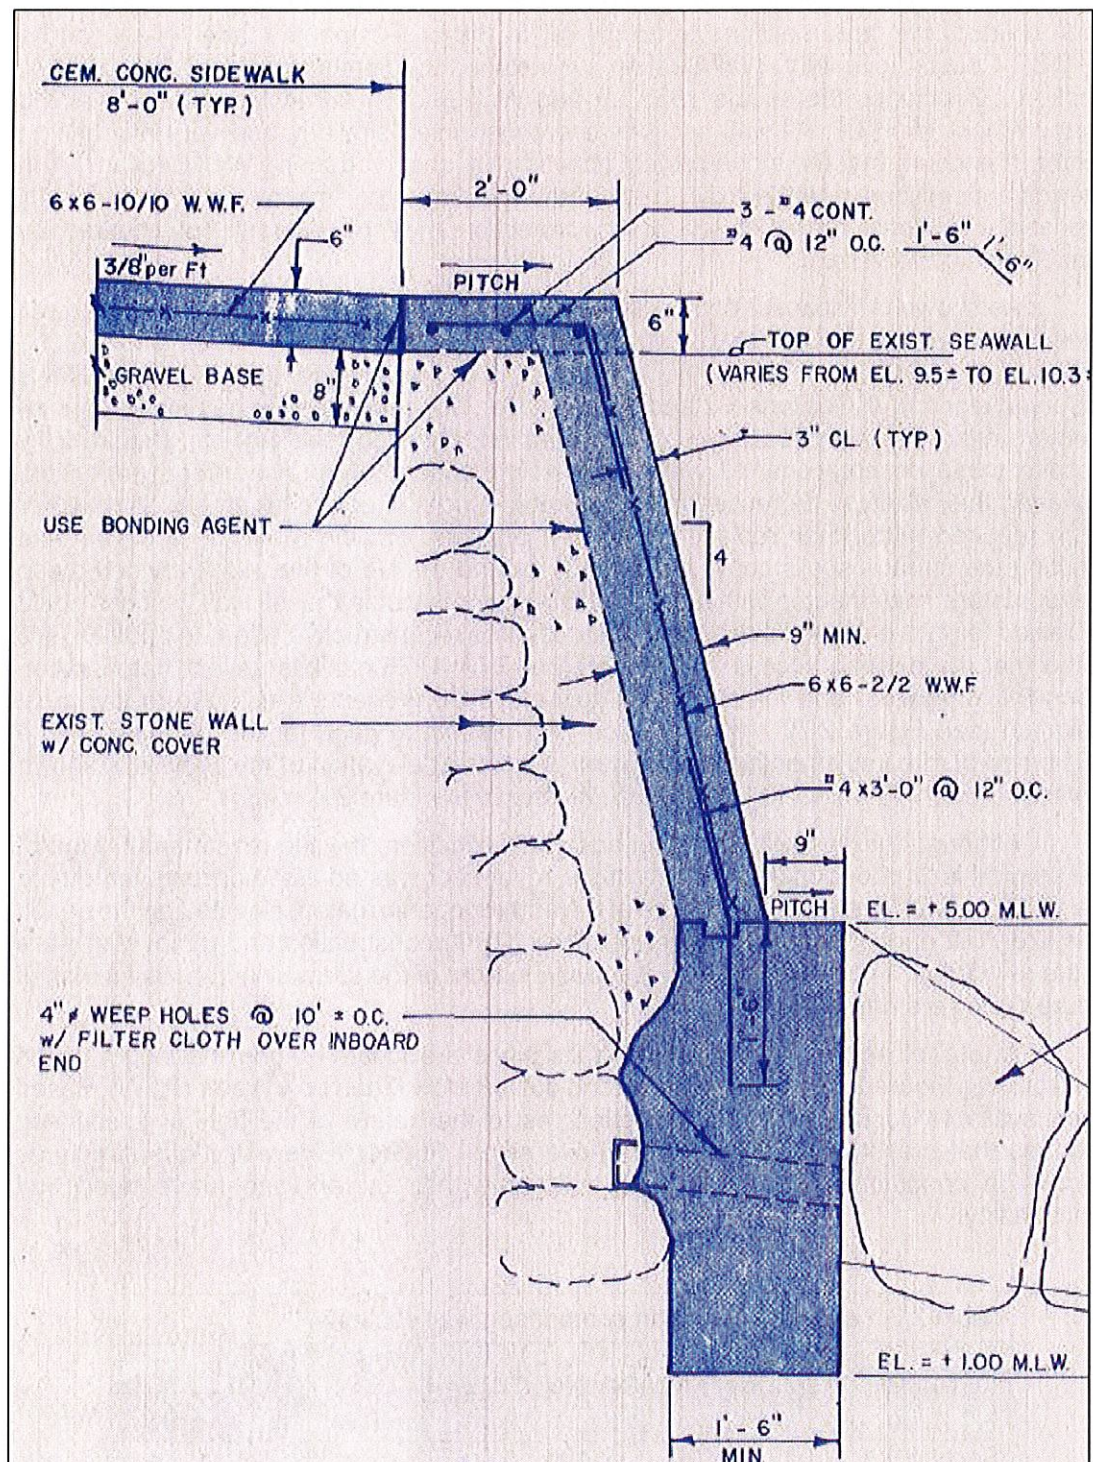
Typical seawall section upon completion of repairs in 1978.
